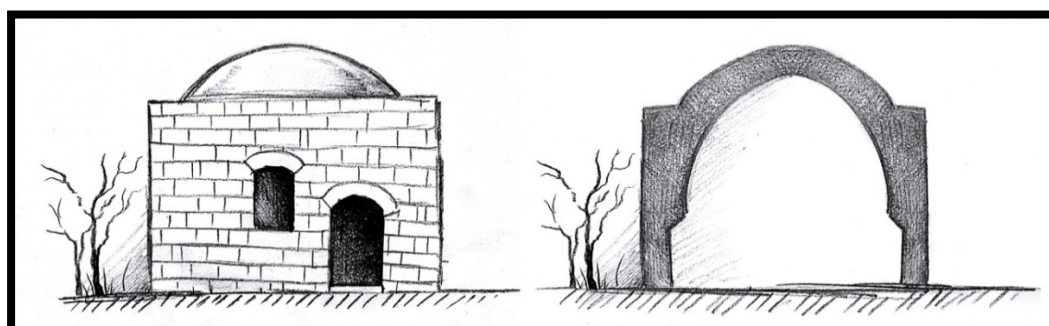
Section in an 'Aqid' room, room No. 5 in the (EL) KG layout, the second classroom
